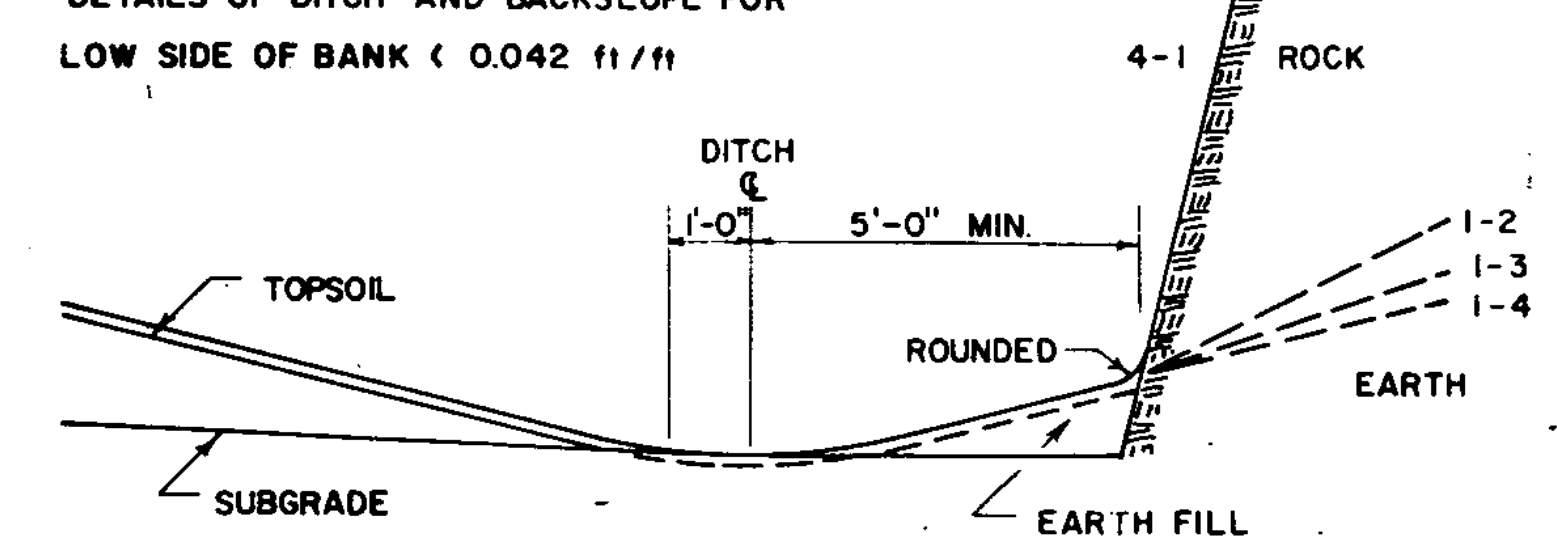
DETAILS OF DITCH AND BACKSLOPE FOR LOW SIDE OF BANK < 0.042 ft/ft
